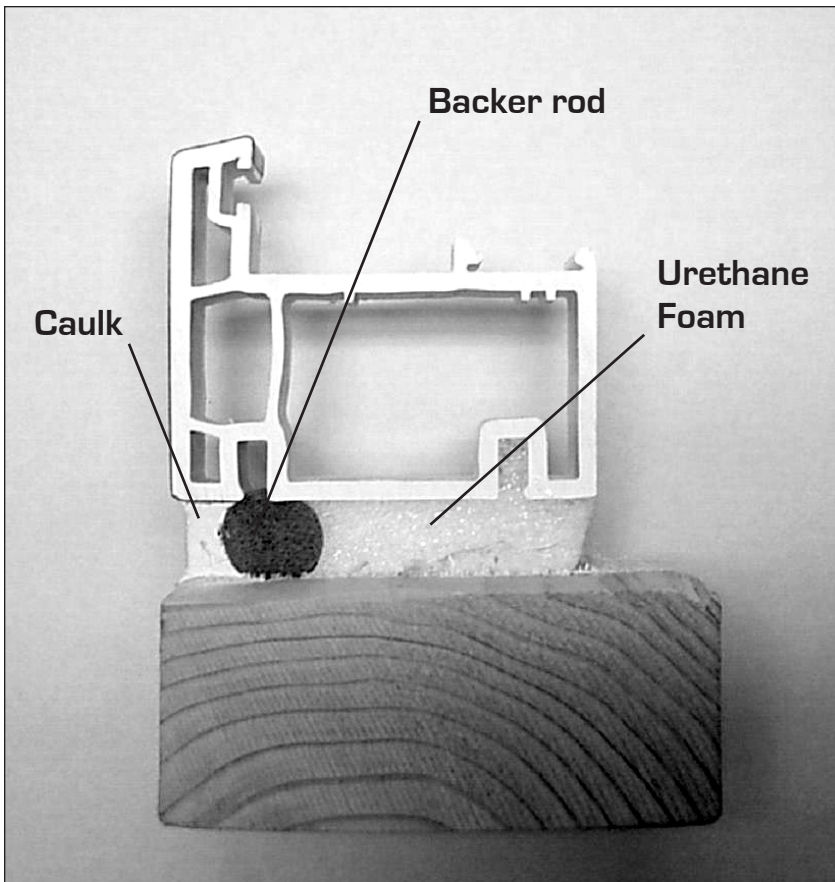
The correct way to seal a PVC window frame to the rough opening using caulk, backer rod, and urethane foam.
